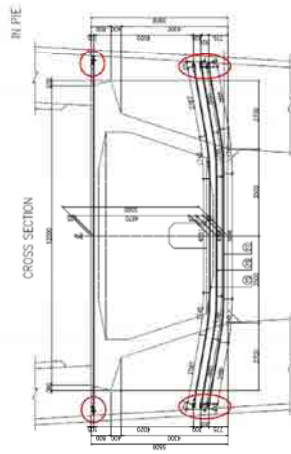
Location of the Anchorages of Cross-section wise Cables inside Cross Beam (P2, P3)
